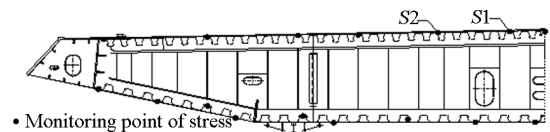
Stress measuring points layout of standard cross section of half of steel box girder
